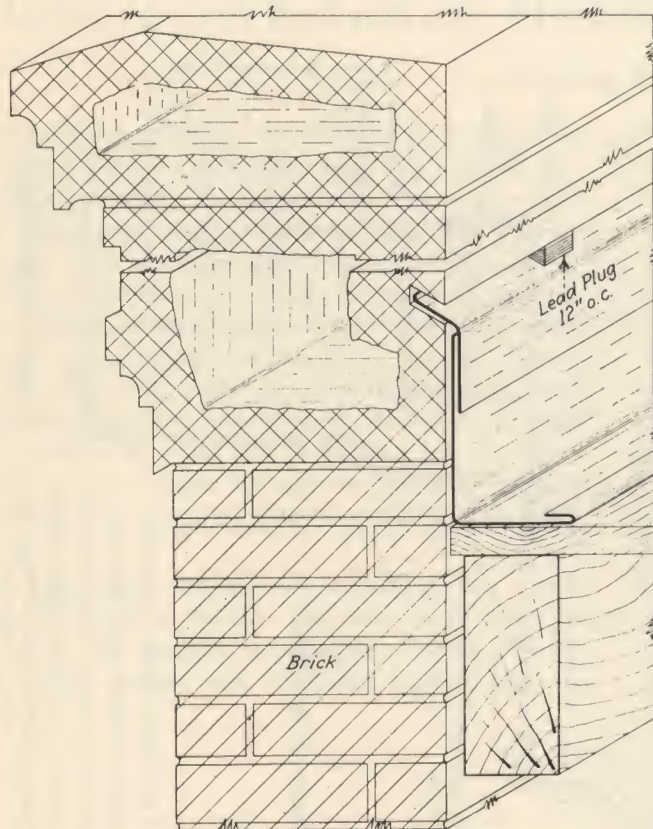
BASE AND CAP FLASHINGS JOINING TERRA COTTA CORNICE ON PARAPET WALL
